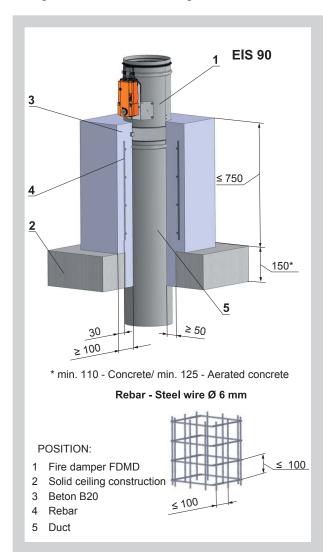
Outside solid ceiling construction - concrete and installation frame
